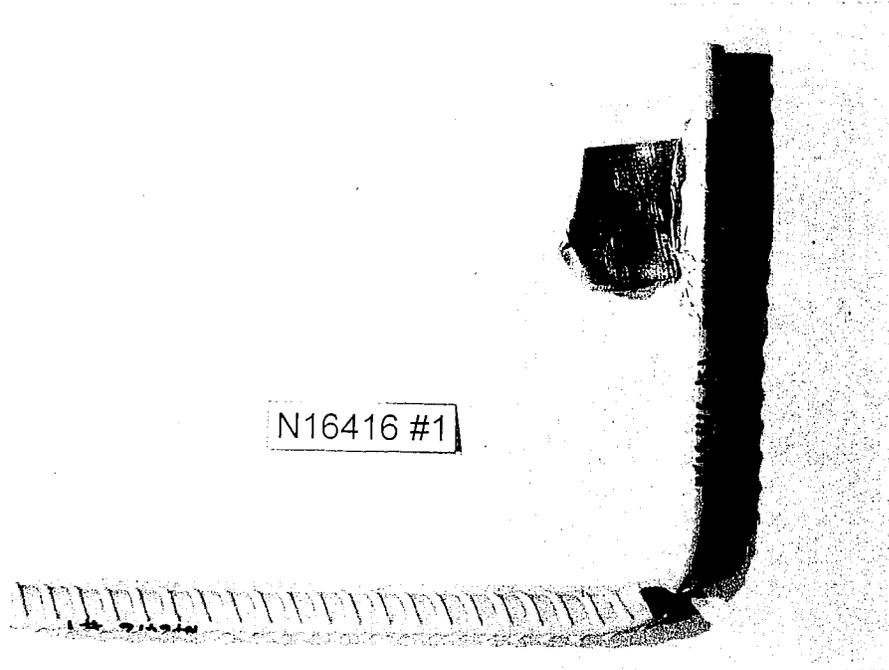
Failed #5 Bar Bend Test Specimen (Co-Steel Heat No. N16416).
